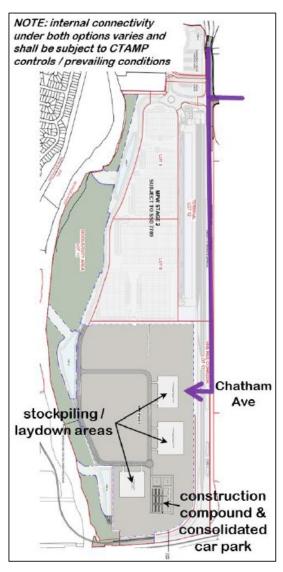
| Chatham Avenue construction access point (Source: Applicant's RtS)
